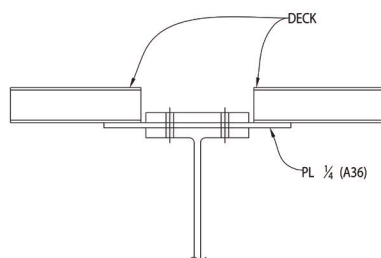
Deck Bearing at Bolted Flange-Plate Connection
